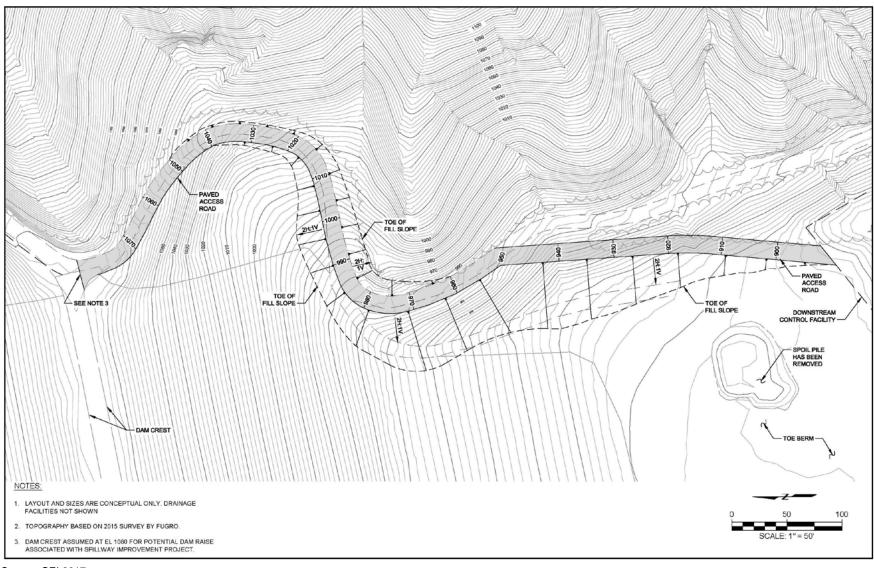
Proposed Improvements to Access Road Along Slope Adjacent to Left (East) Abutment
